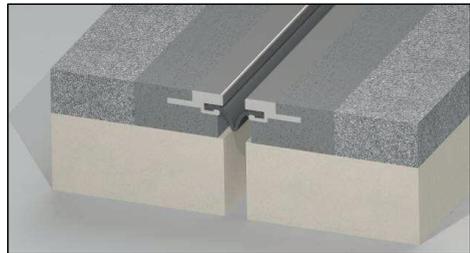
Single gap joint with anchorage in high-strength polymer concrete
